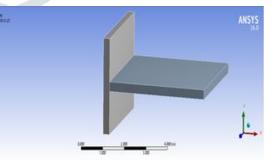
Geometry of Existing wall and Post-installed wall to slab connection
